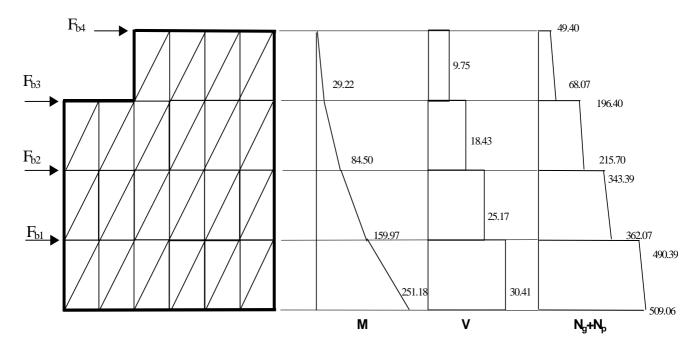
Static design of the prefabricated wall elements in the y-direction.
